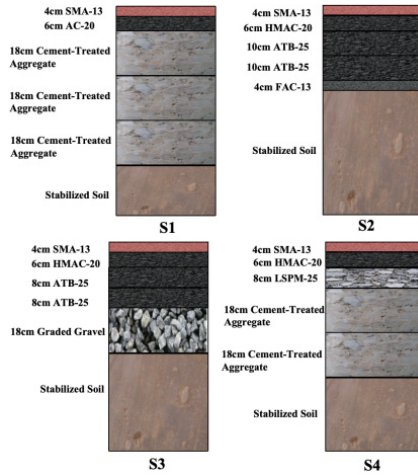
Experimental Observation Section of Asphalt Pavement Structure
